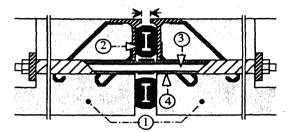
Hinged slab joint. (1) Connecting slab. (2) Elastomeric pads. (3) Prestressing bar. (4) Elastic grout (Fip-Industriale system)
